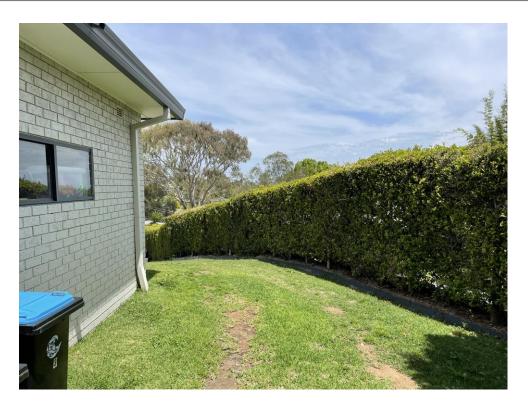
View looking south towards the proposed carport location forward of the dwelling
